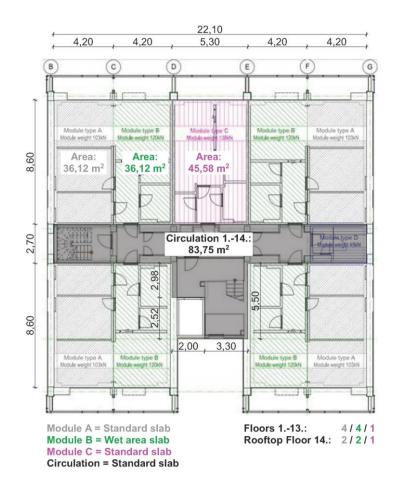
Area and module floor plan (ARTEC 2013, edited)
